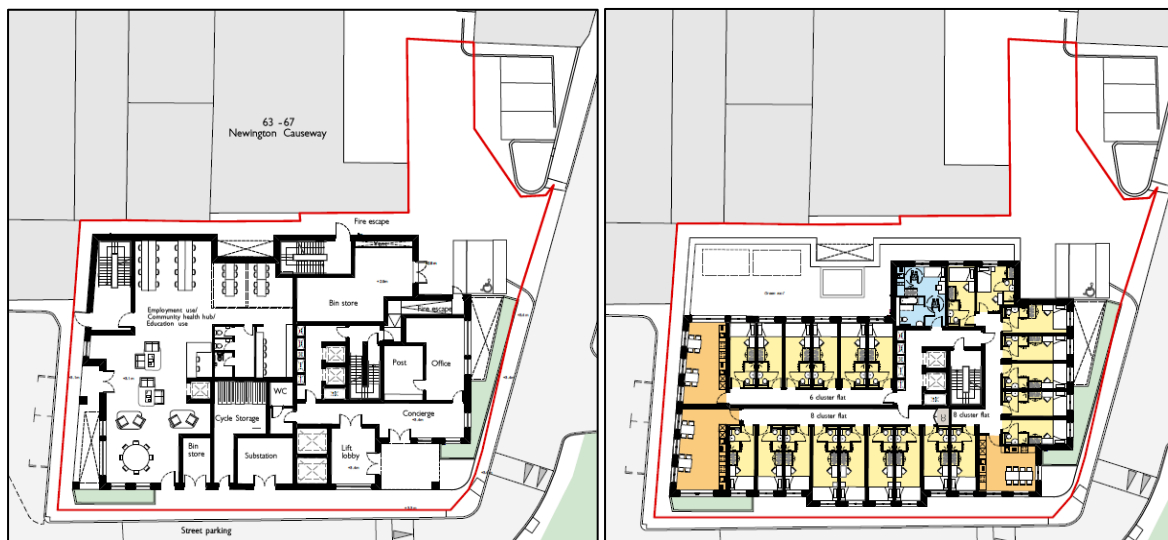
Site Proposals – Ground Floor and Third Floor (Extract)
